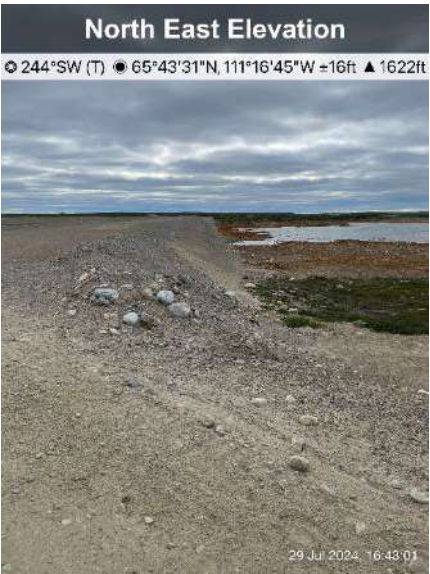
Overview of the K Dam downstream embankment and toe area as viewed from near its right northeast abutment.
